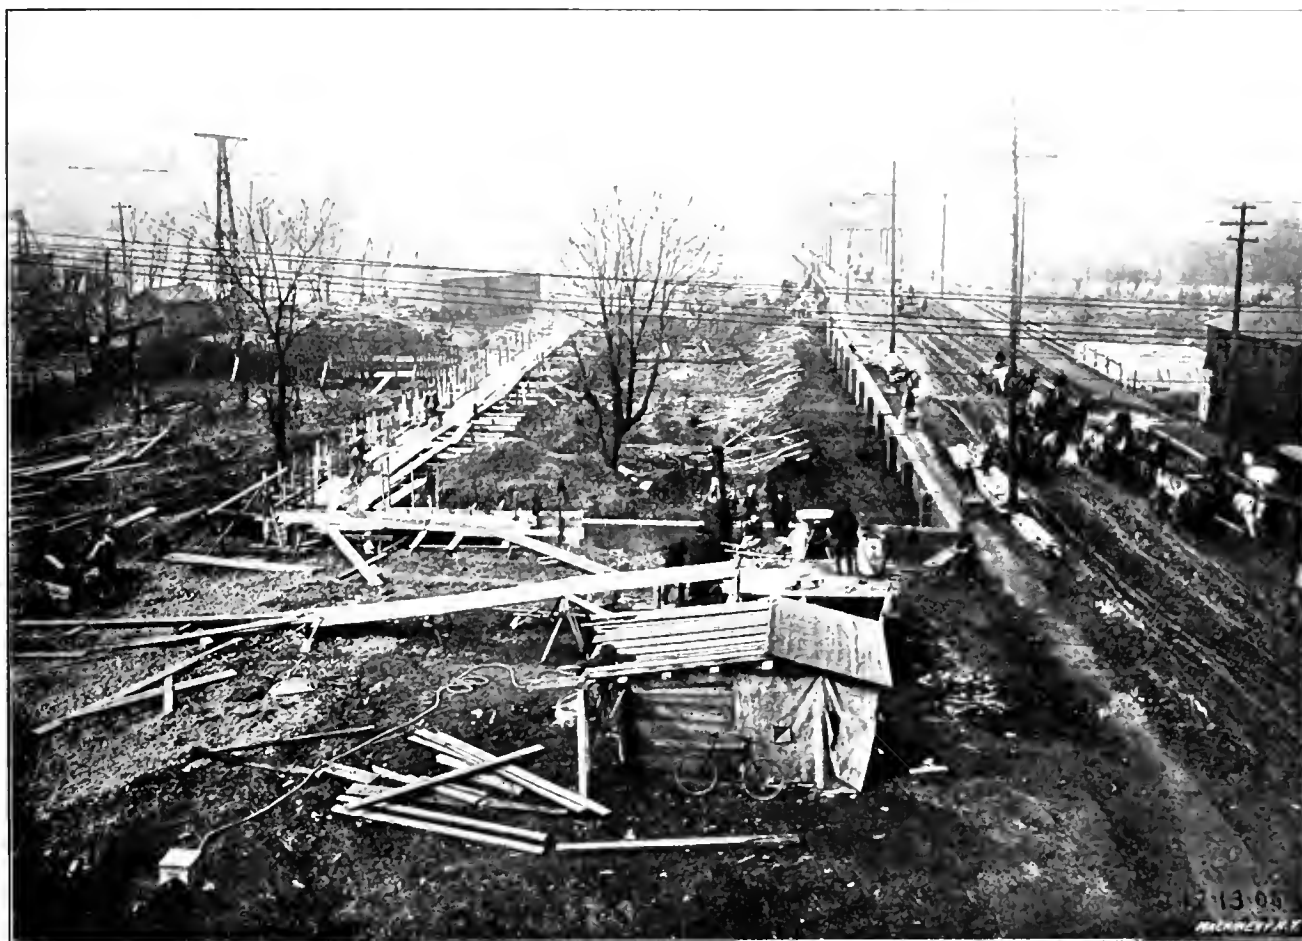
A Job on which the Contractor put in a Bill for 1,000 Extra Cubic Yards of Excavation. The Photograph Helped to settle the Bill for Something like 100 Yards.
